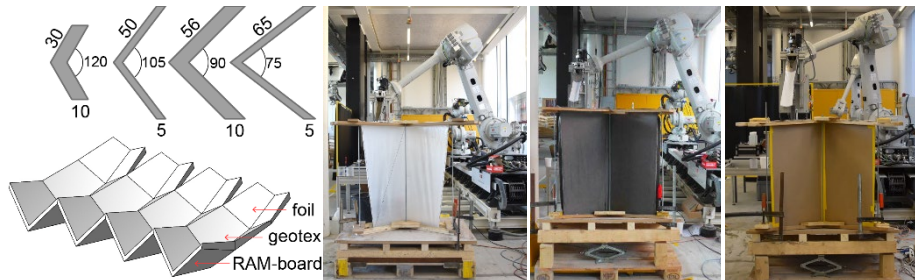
The design of the folded roof section with varying cross-section [cm] consisting of three elements cast in weakly supported formwork with the robotic setup.
